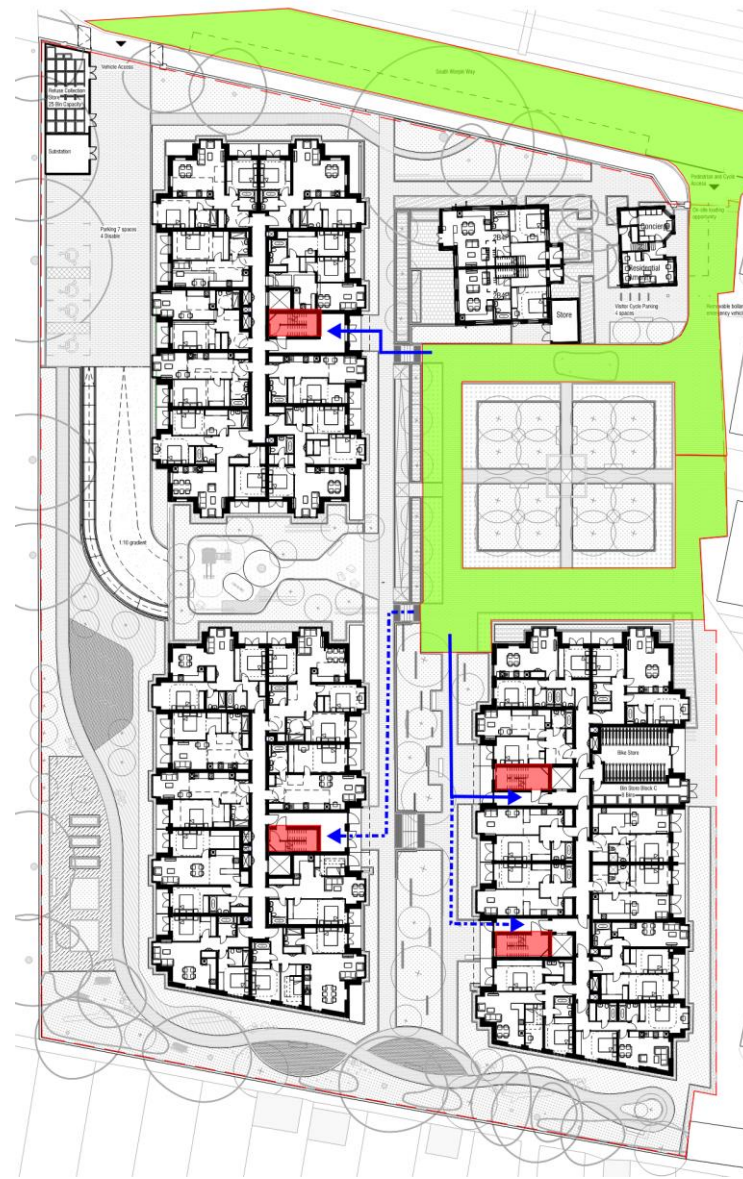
Site plan illustrating fire service vehicle access routes in green. Escape stairs are indicated in red, and firefighting access within 18m of dry riser indicatively shown blue, dashed line for blue indicated extended firefighter access of more than 18m. See section below.
